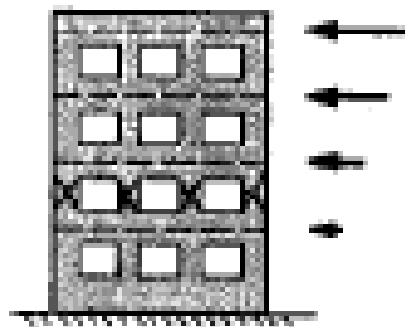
Undesirable pierced walls for earthquake resistance (source: Paulay and Priestley, 1992)
